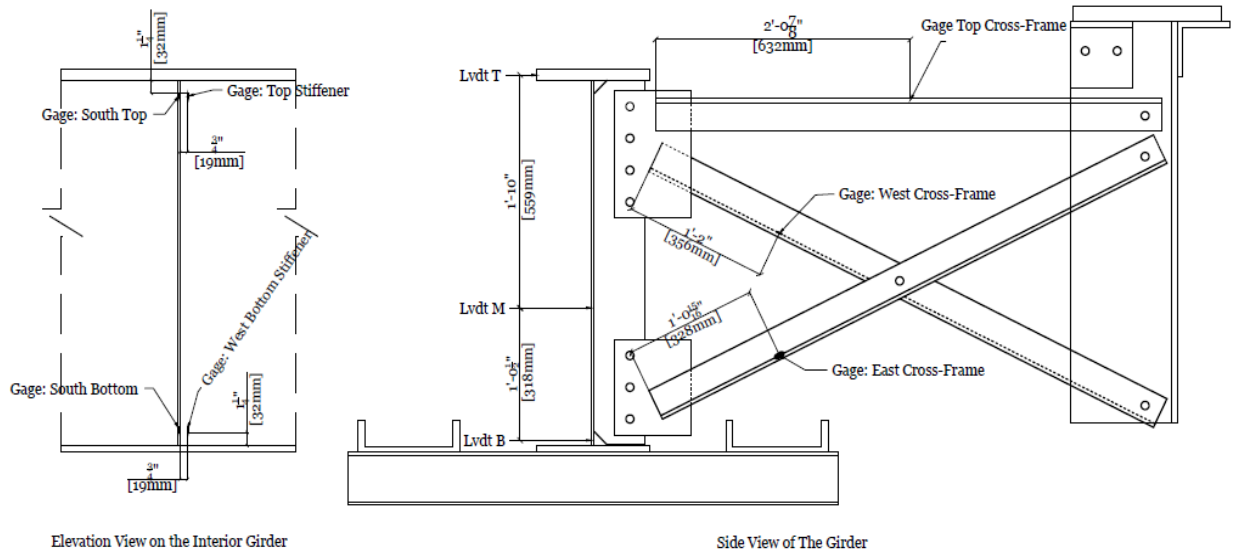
Instrumentation applied on 9ft-steel girder segment
